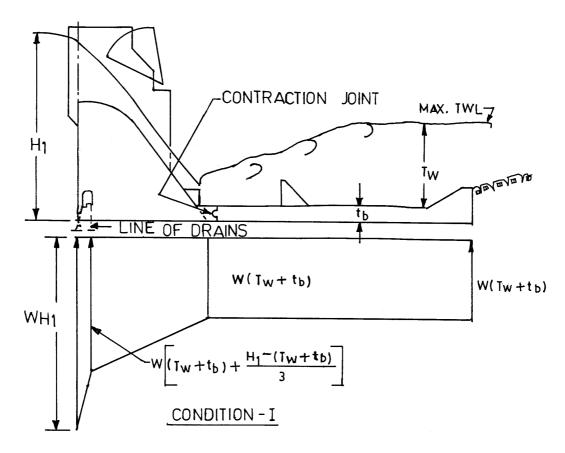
Spillway Operating at Design Flood (Uplift Diagram)
